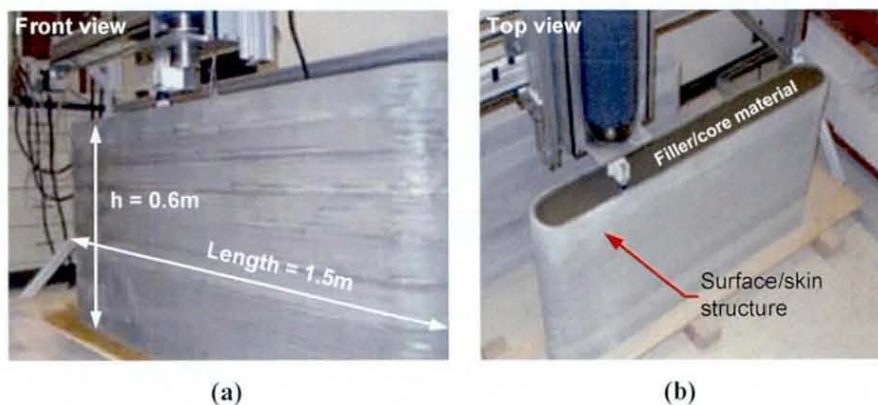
Prototype wall by CC: (a) Full scale concrete straight wall section; (b) filler/core material within a surface skin structure (Khoshnevis, 2005).
